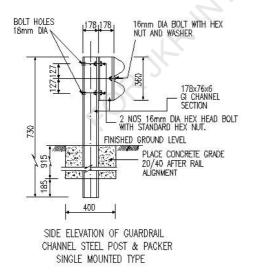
Typical Standard Drawing for W-Beam Guardrail
